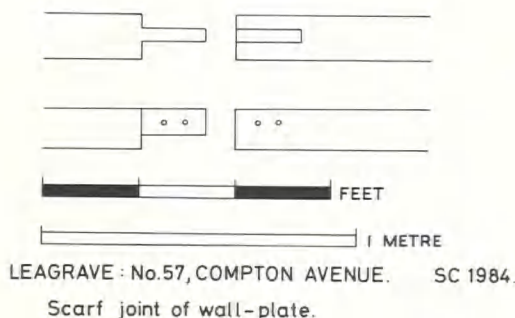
Legrave: No. 57, Compton Avenue. Secret bridled scarf joint of the west wall-plate
